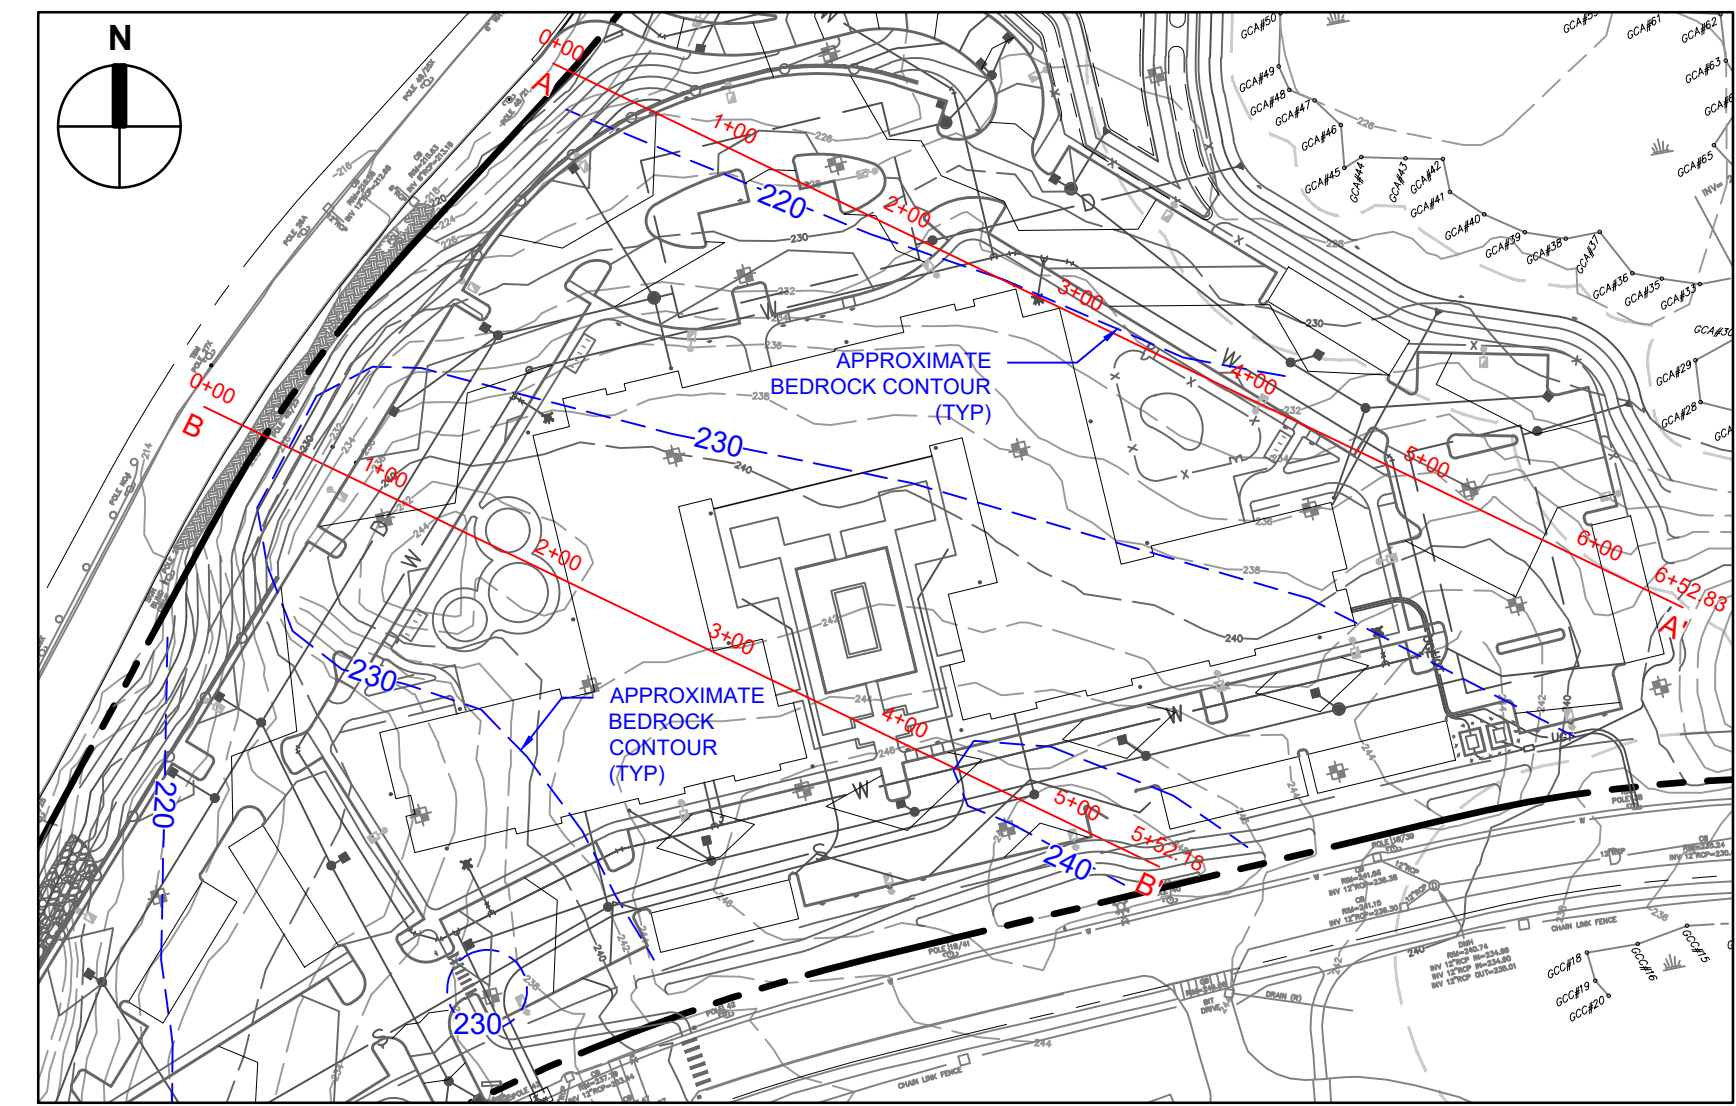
EXHIBIT: BEDROCK ELEVATION PLAN/PROFILE (APPROX.)
